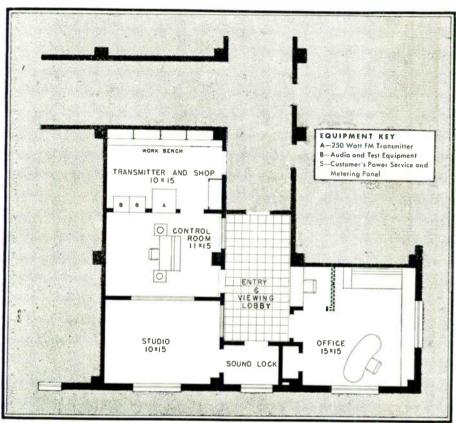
PLAN FOR THE ARRANGEMENT IN FIG. 1, FOR OFFICE BUILDING LOCATION
